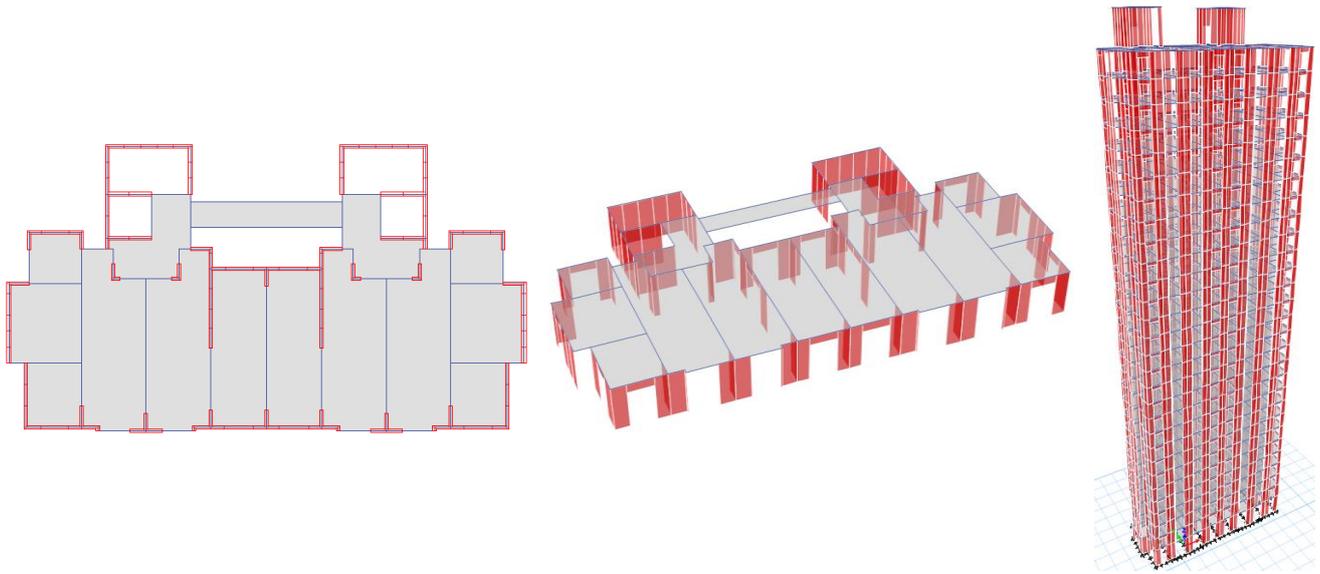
Ground structure and discretization (wall element length = 1 m) of the shear walls for model-1
